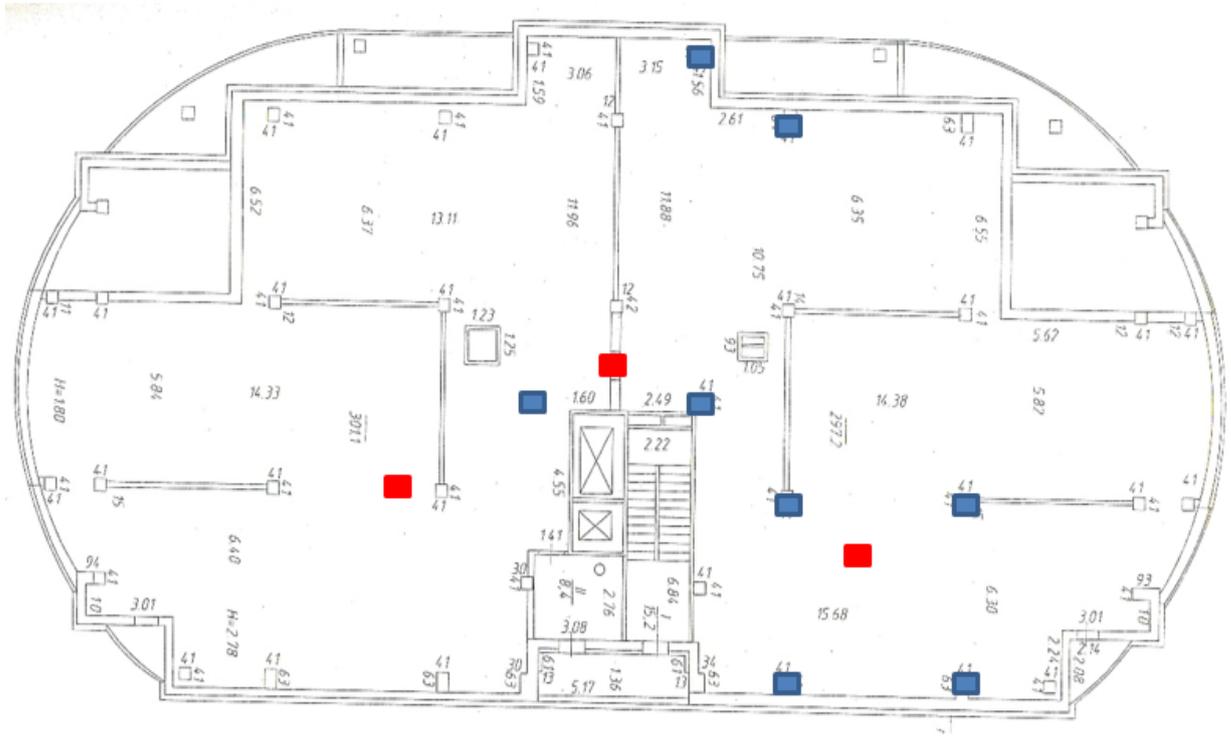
The scheme of ultrasound examinations of the technical floor of the building (blue-reinforced concrete columns; red-reinforced concrete slabs)
